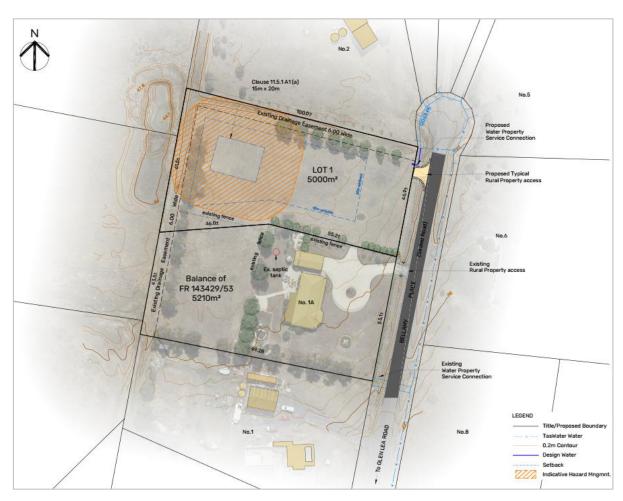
Proposed Plan of Subdivision (Please refer to the attached file PDA 52412CT-P1-A for complete Plan of Subdivision)
